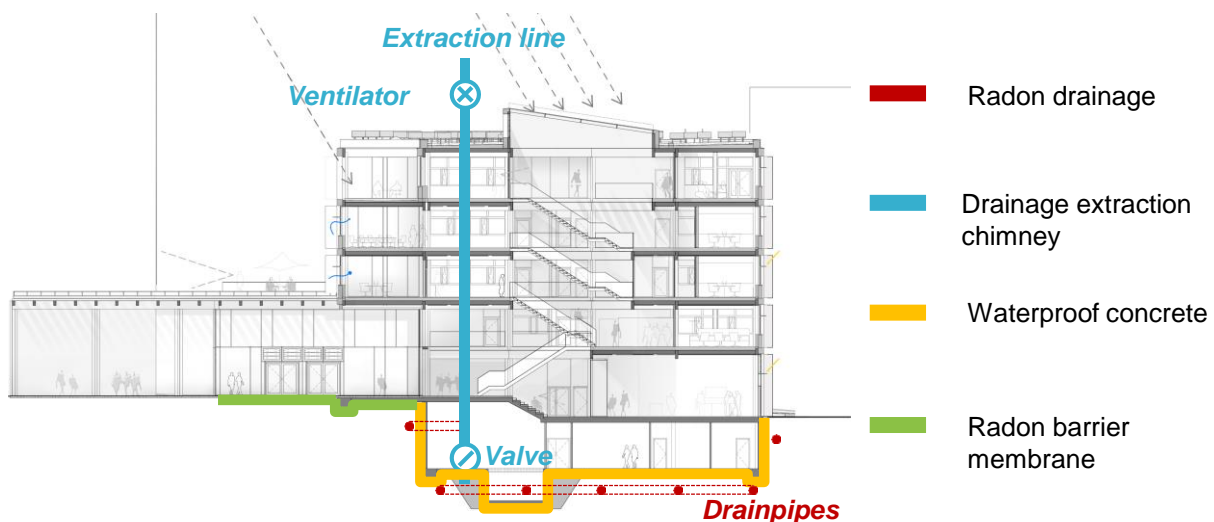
Construction measures put in place. West: radon barrier membrane at the level of the ground floor slab (in green); east: waterproof concrete (in yellow) and radon drainage (in red and blue) under the subsoil slab and peripheral walls.
